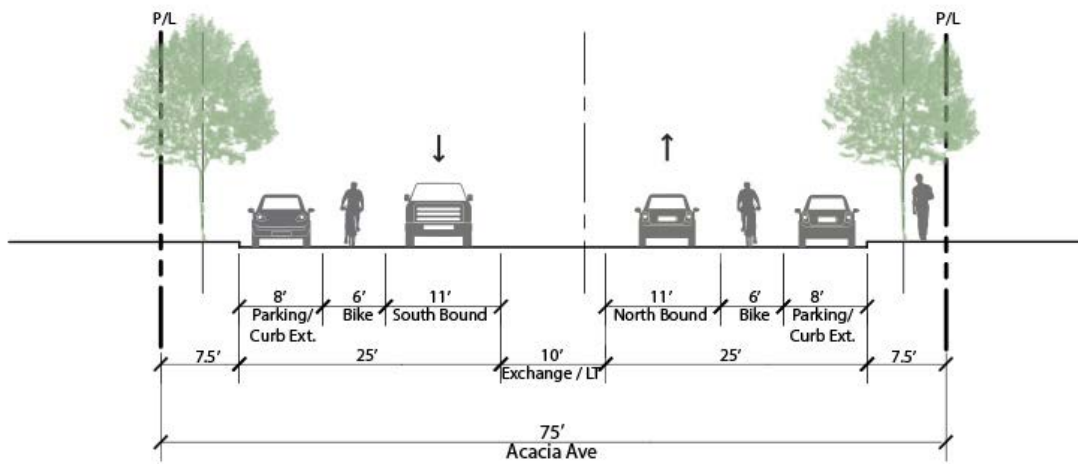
Acacia Avenue Typical Cross-Section, Compton Boulevard to Myrrh Avenue.
